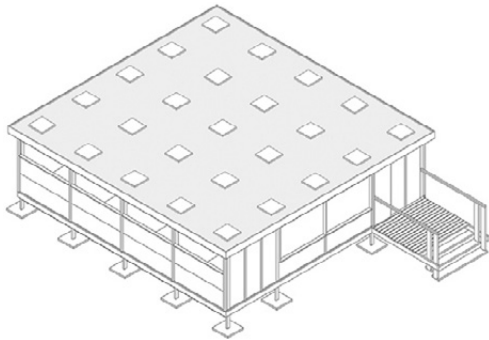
| Walter Segal, temporary house in the garden (1962) in Highgate, London (credit: the Author, 2023).
